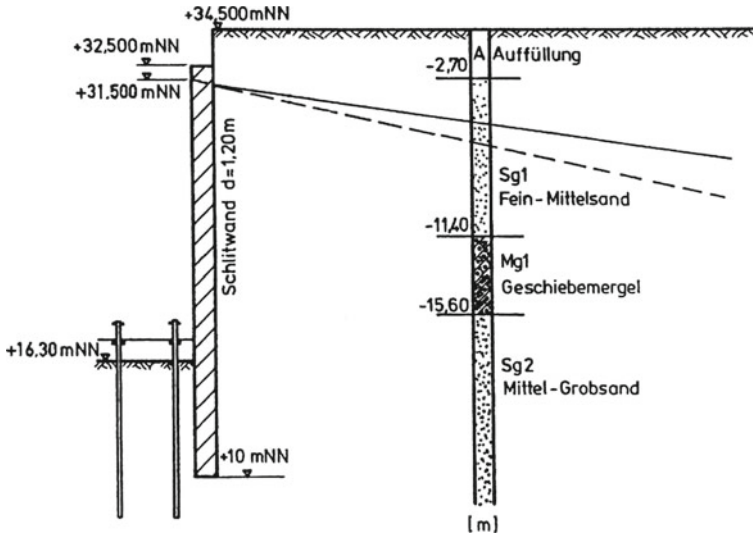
Cross-section of excavation and soil profile, cf. [12]
